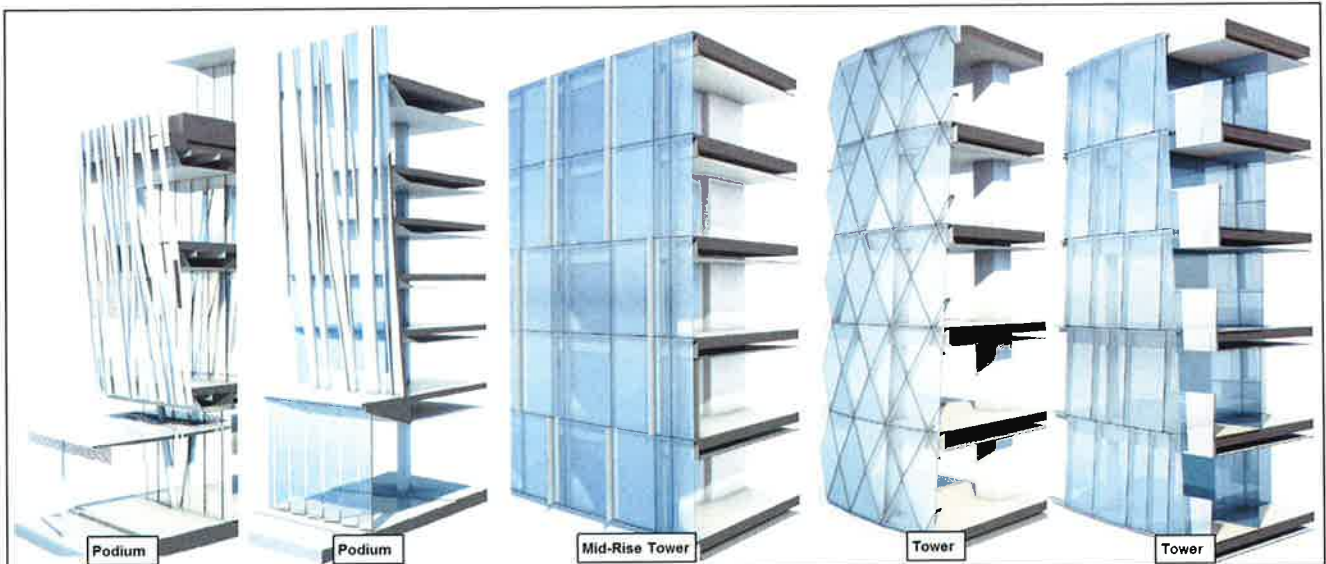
Elevational sections showing the key façade treatments for the podium, mid-rise tower and the tower (Base source: Applicant's EIS)
